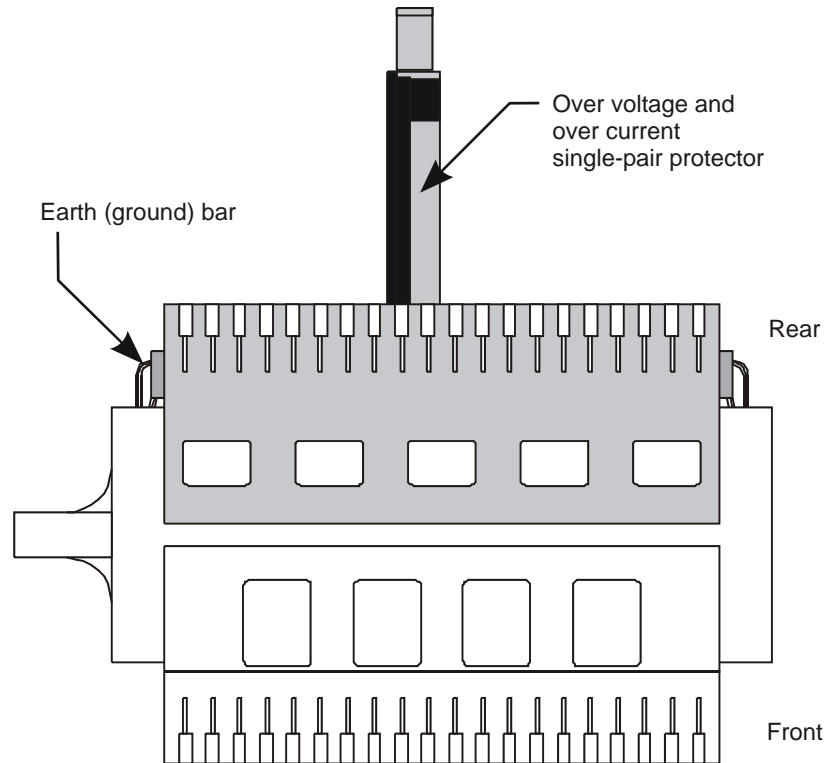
Top View of Single-Pair Protector Rear Mounted on Exchange Side of MDF When Using "Hinged" Type Connecting Block Mounting Bracket (only normally closed connector modules used).
